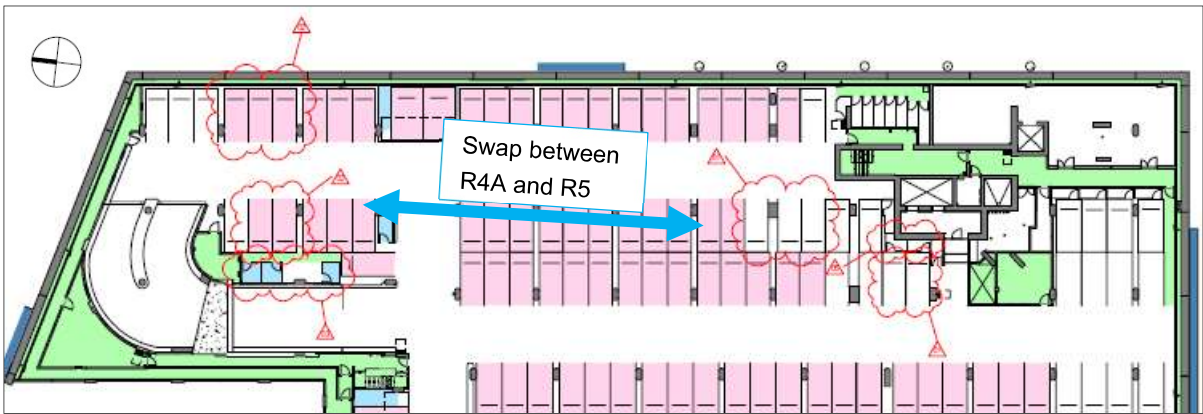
| Proposed plan of Level B2 (east), with clouded pink/blue spaces reallocated to Building R4A, and clouded white spaces and cages reallocated to Building R5
